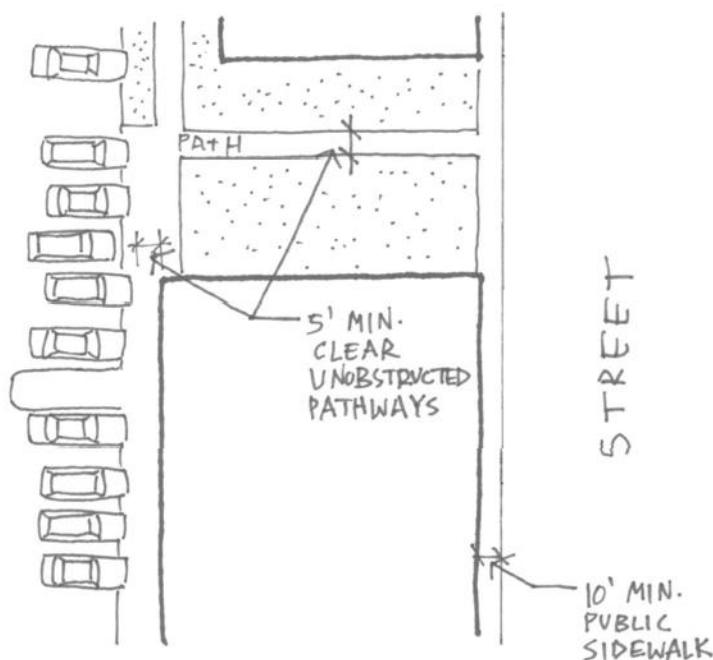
5-Foot Unobstructed On-Site Pedestrian Pathways
